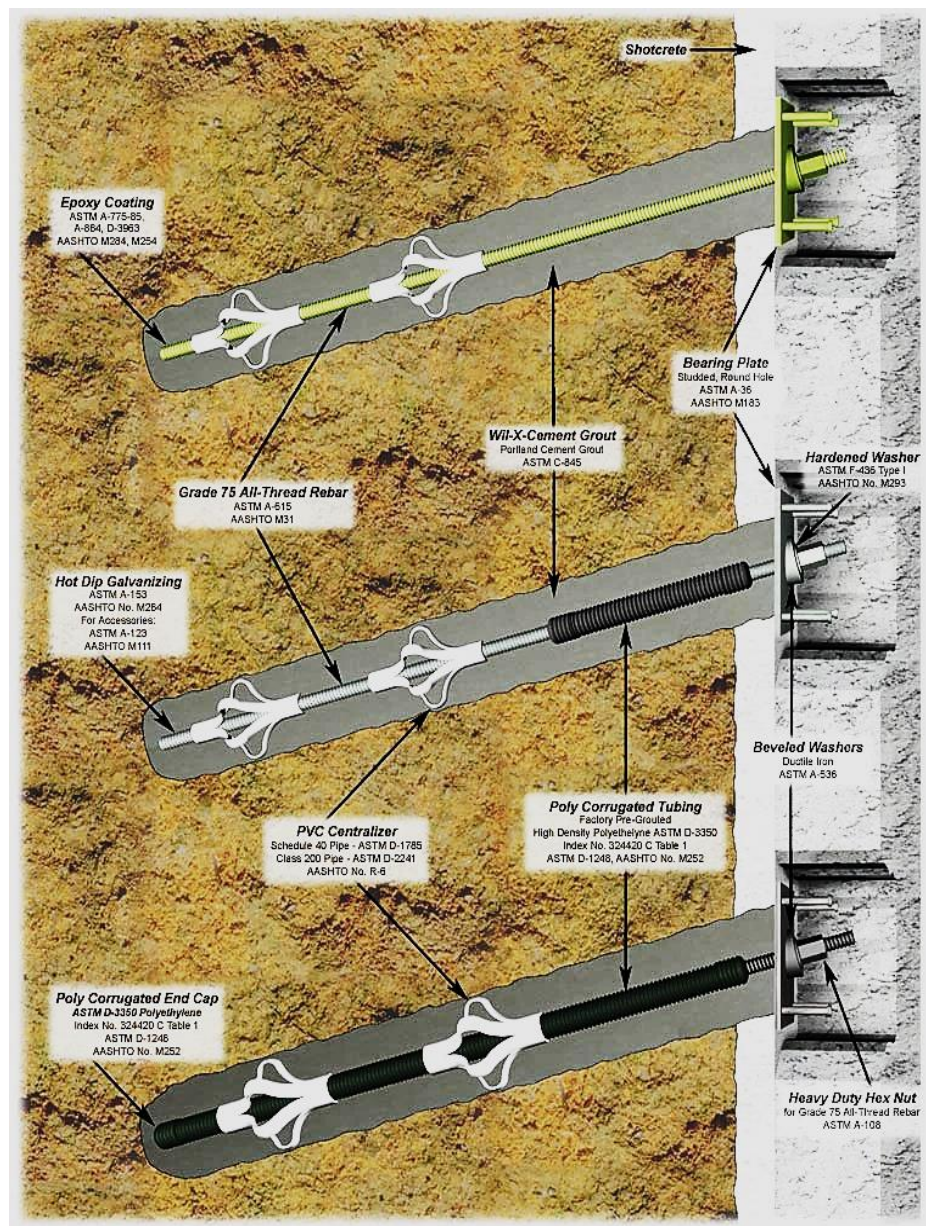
Elements of soil nailed wall (Source: <https://www.regnumstroy.ru/en/soilnail.php>)
